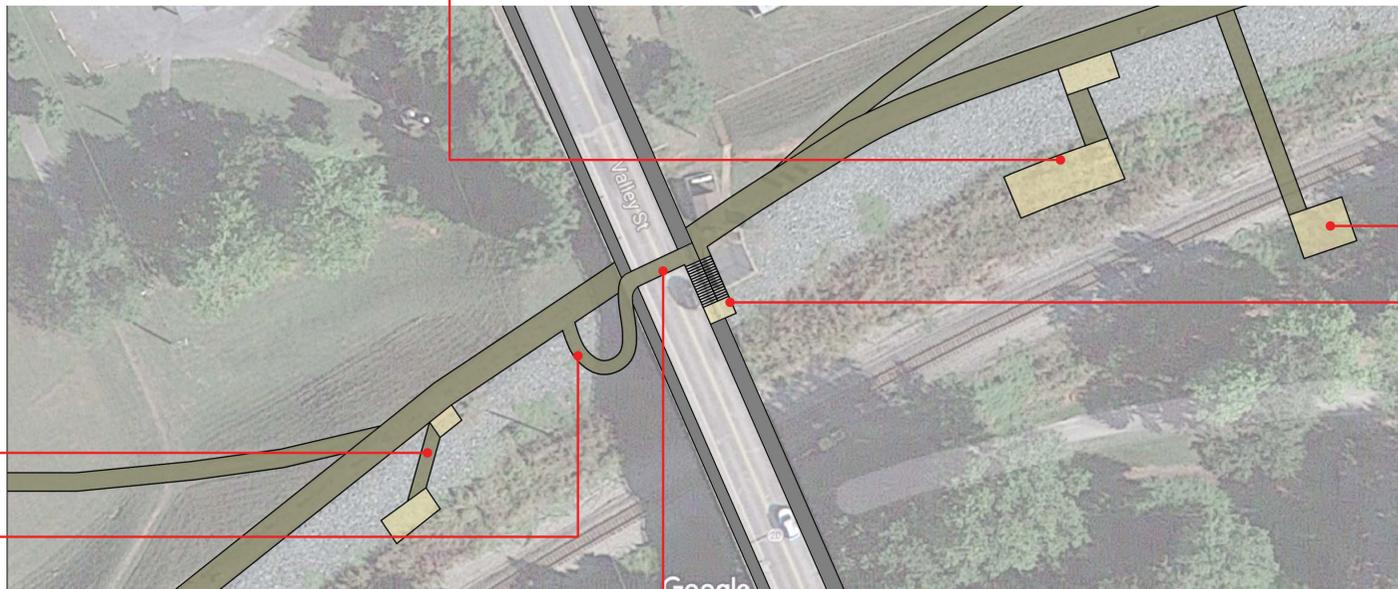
Plan of the levee path, platforms and pedestrian bridge
